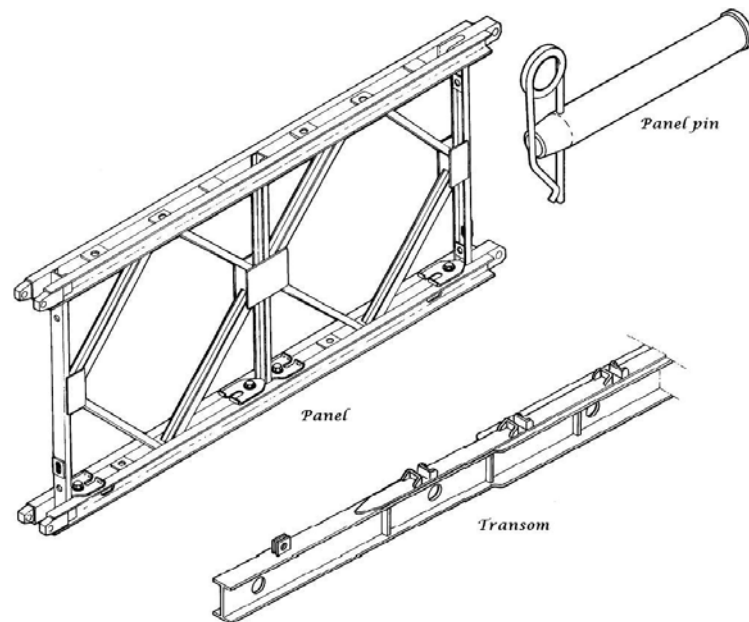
Main assembly parts of a Bailey truss [22].
